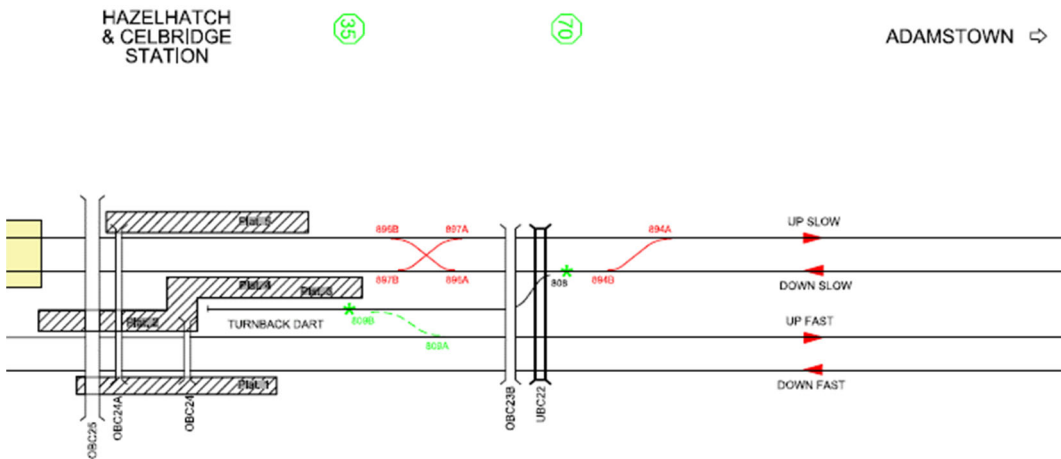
Hazelhatch & Celbridge Station – Schematic Track Plan (in red trackwork within this project)
